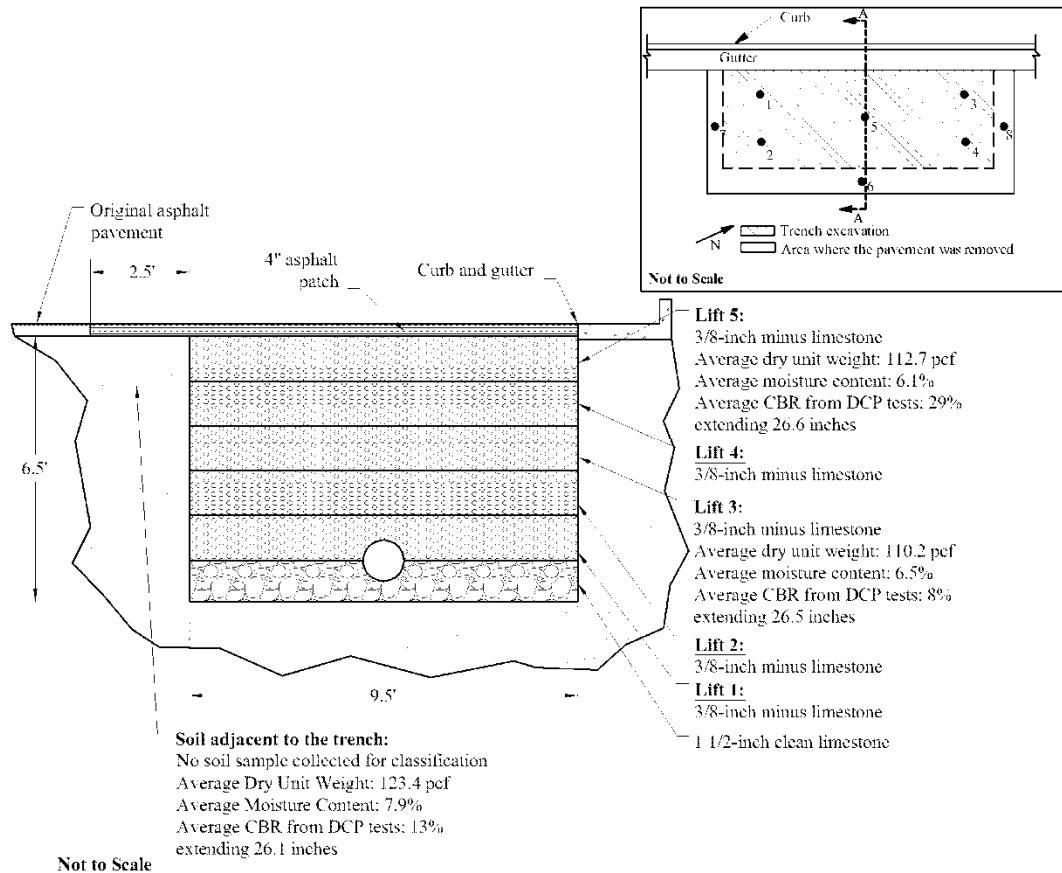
North-south cross-section of Trench A; a) plan view, b) cross-section (Note: Testing locations 6, 7, and 8 were located in the soil adjacent to the trench)
